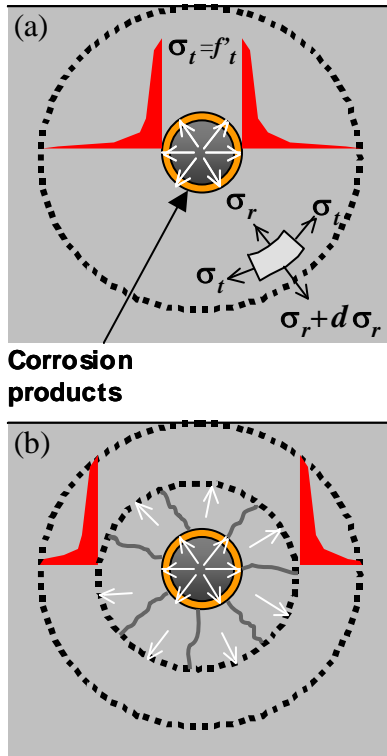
Thick-wall cylinder model of corroding reinforced concrete deck: (a) Tensile stresses developed at crack initiation; (b) Propagation of internal cracks in thick-wall concrete cylinder. Adapted from Lounis *et al.* 2006.
